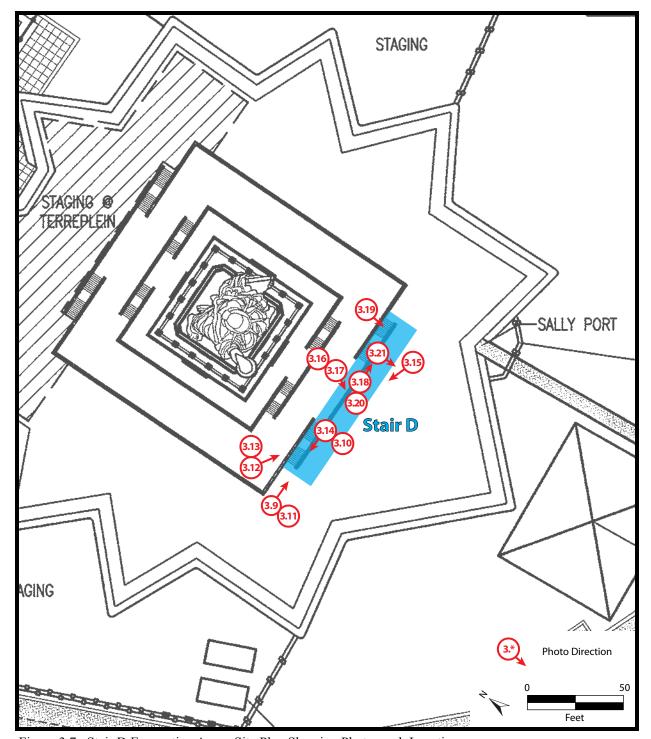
Stair D Excavation Area: Site Plan Showing Photograph Locations.
